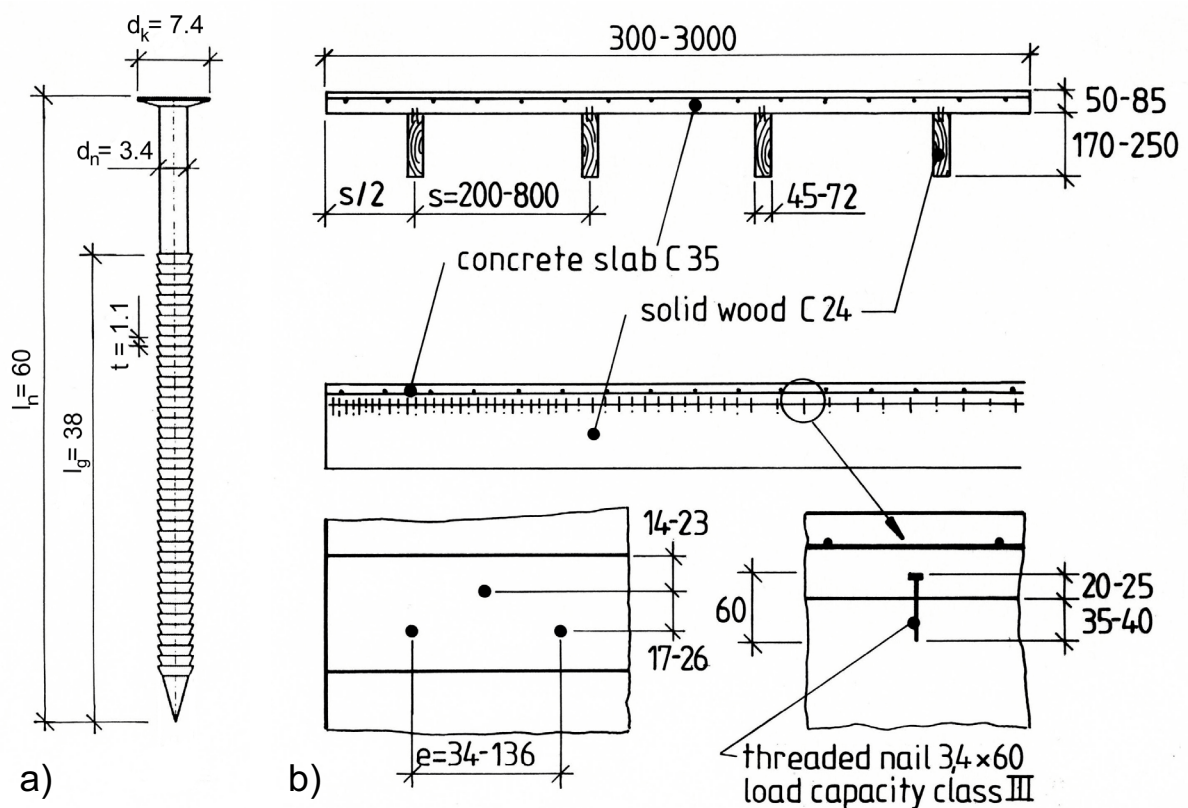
, b: Timber-concrete connection system with small sized threaded nails for the EW element acc. to Z-9.1-331 [6]
